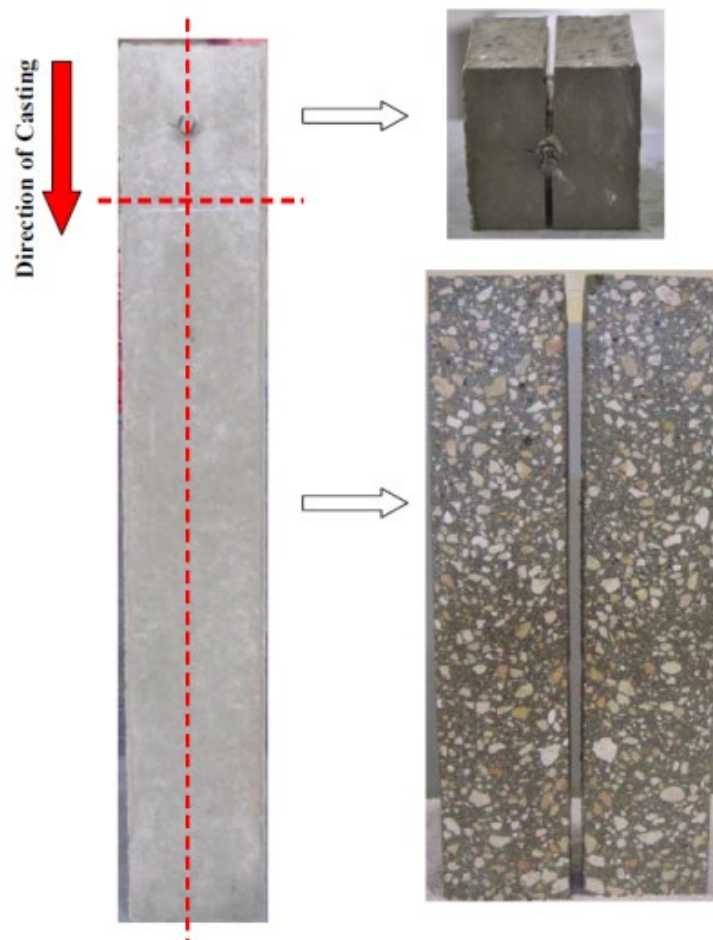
The sectioning pattern on column-type specimens with reinforcement. Dotted lines indicate the cutting lines followed while bisecting the elements.
